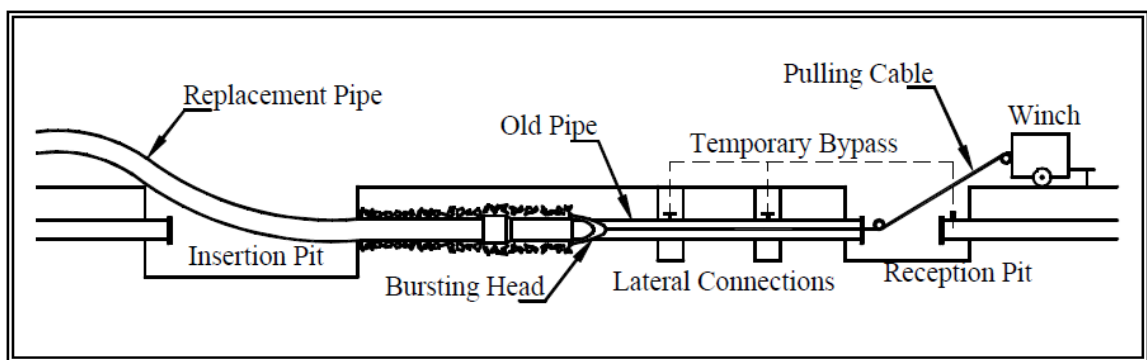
Typical pipe bursting operation layout (Simicevic & Sterling 2001)
